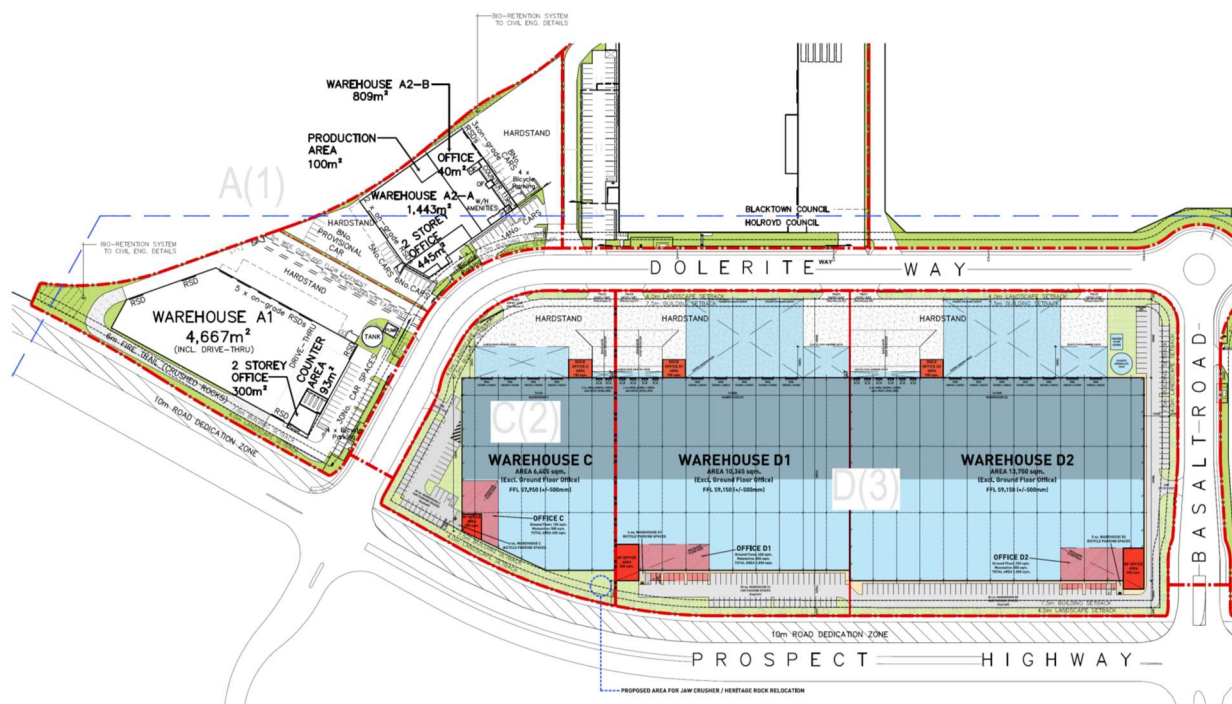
QuarryWEST Precincts C and D Site Plan – As Proposed
